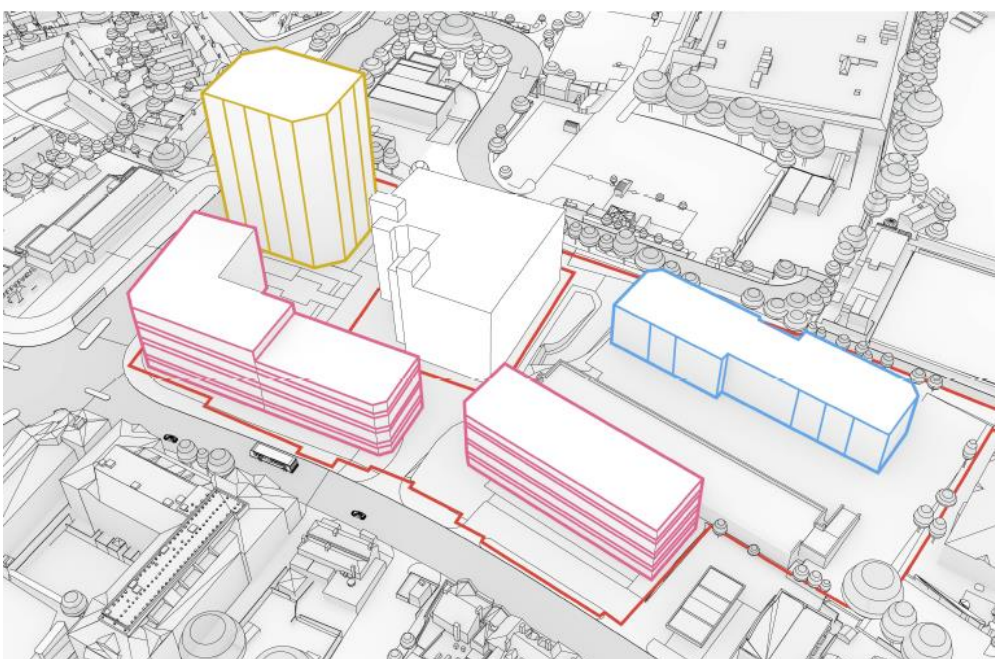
Extract of proposed architectural design Vertical and Horizontal Expression of Proposed Development (AFK Studios). The principal façade expression is designed to reinforce the three distinct block typologies, employing vertical, horizontal, and segmented architectural languages respectively
